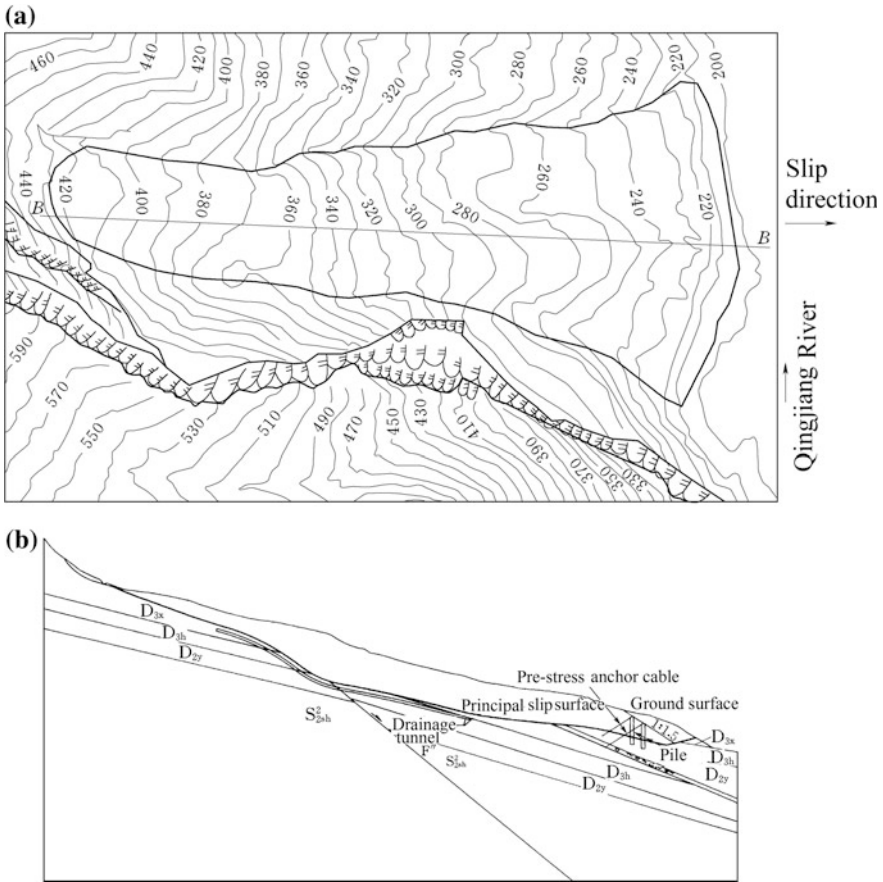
Dayantang landslide. a Plan; b principal section B-B
